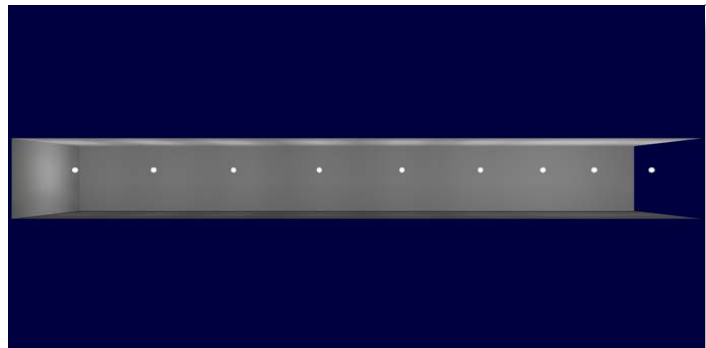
Lighting Calculation: First Floor West Corridor
